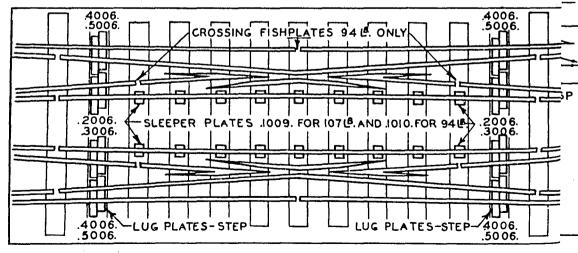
No. 7:52. 94&107 LB. COMPOUND. DETAIL AT K CROSSINGS
